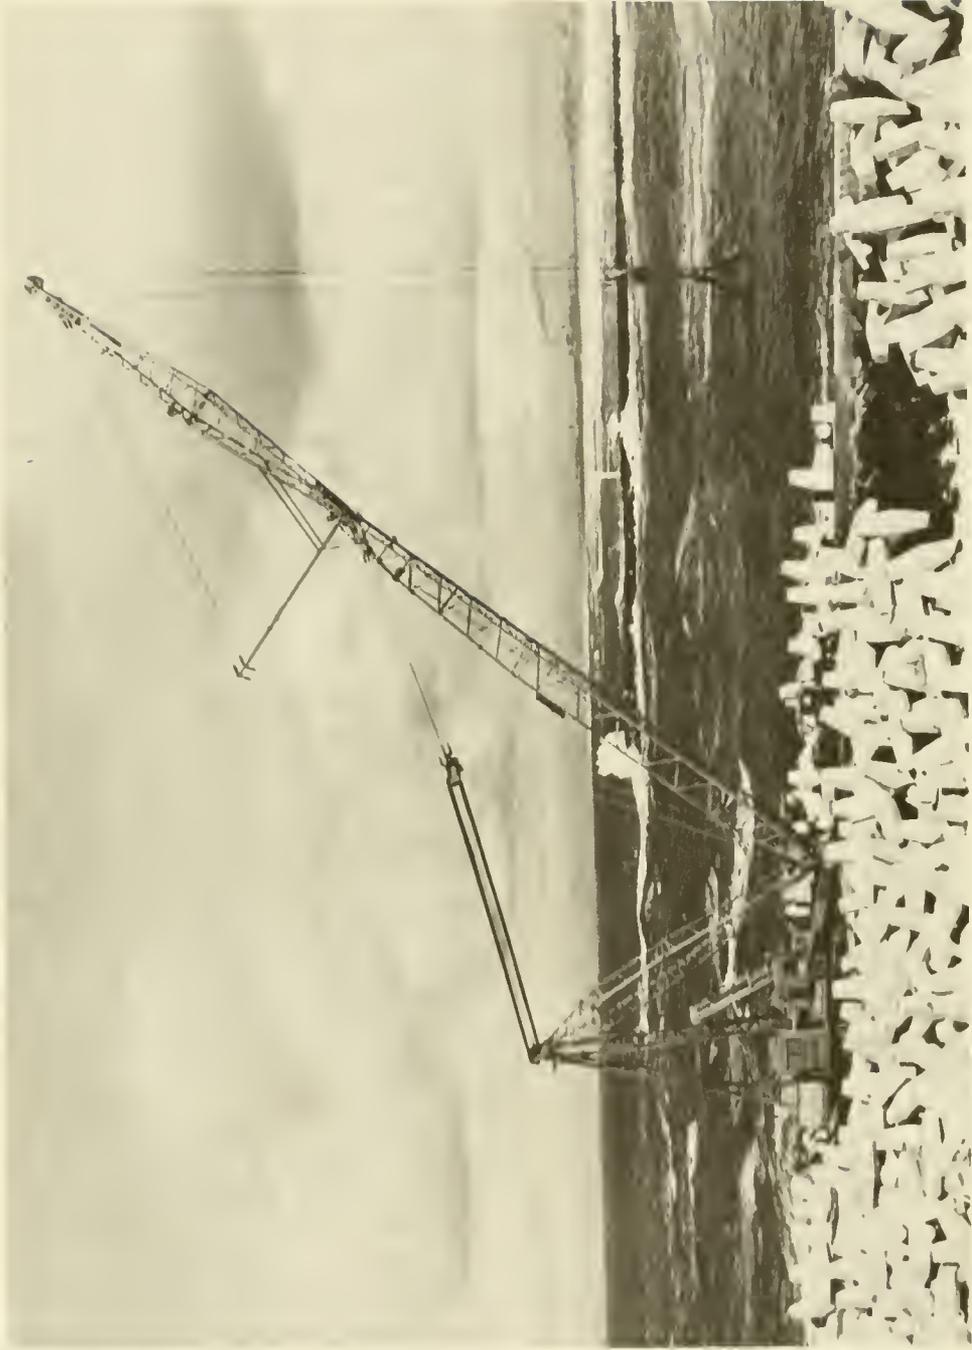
Dolosses are being installed as protective facing on this rubble mound jetty in Humboldt Bay, California. Note north jetty in background. Photograph courtesy of U.S. Army Corps of Engineers, South Pacific Division.
